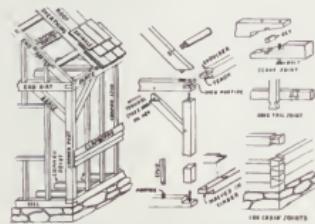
Framing diagram; Left, Typical frame of an early American house. Center, expanded view of frame showing the joints. Right, other joints commonly used in houses as well as the log cabin joint.
